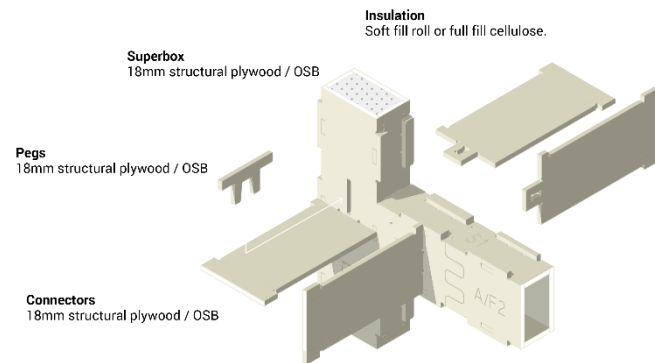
An example joint (Wren) downloaded from Wikihouse website that needs structural verification. Source: Wikihouse
